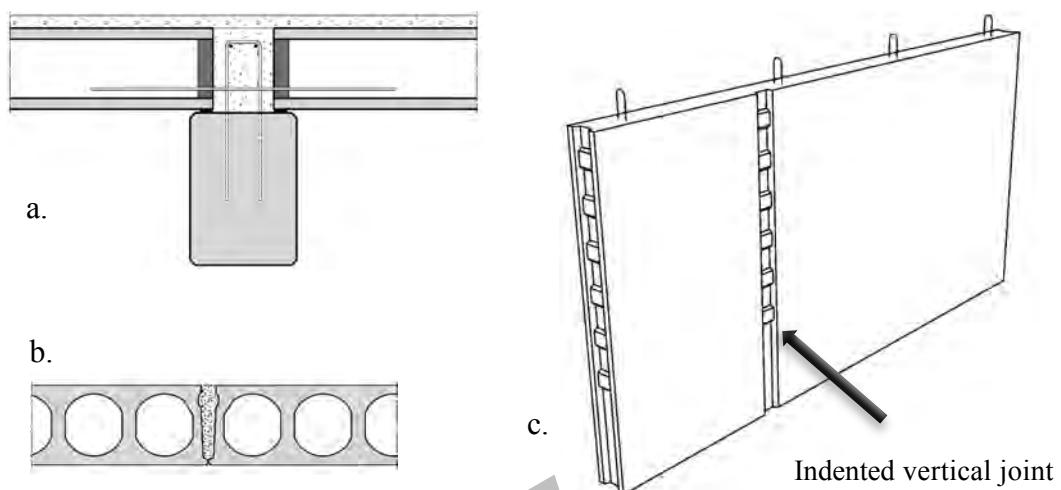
Shear joints: a. horizontal shear transfer between floor and supporting beam through friction and stirrups; b. vertical shear transfer between floor units through the profile of the joint; c. shear transferred through indented vertical joints between wall panels
